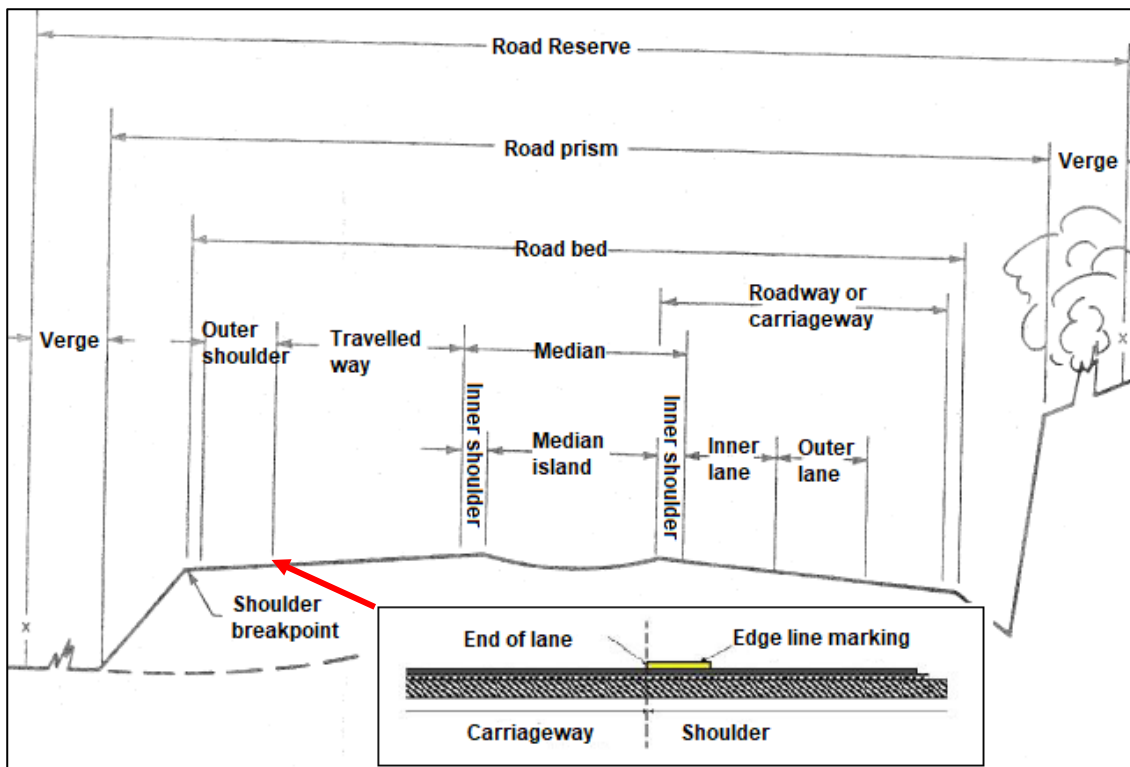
Lane width in the road cross sectional design (CSRA, 1988)
